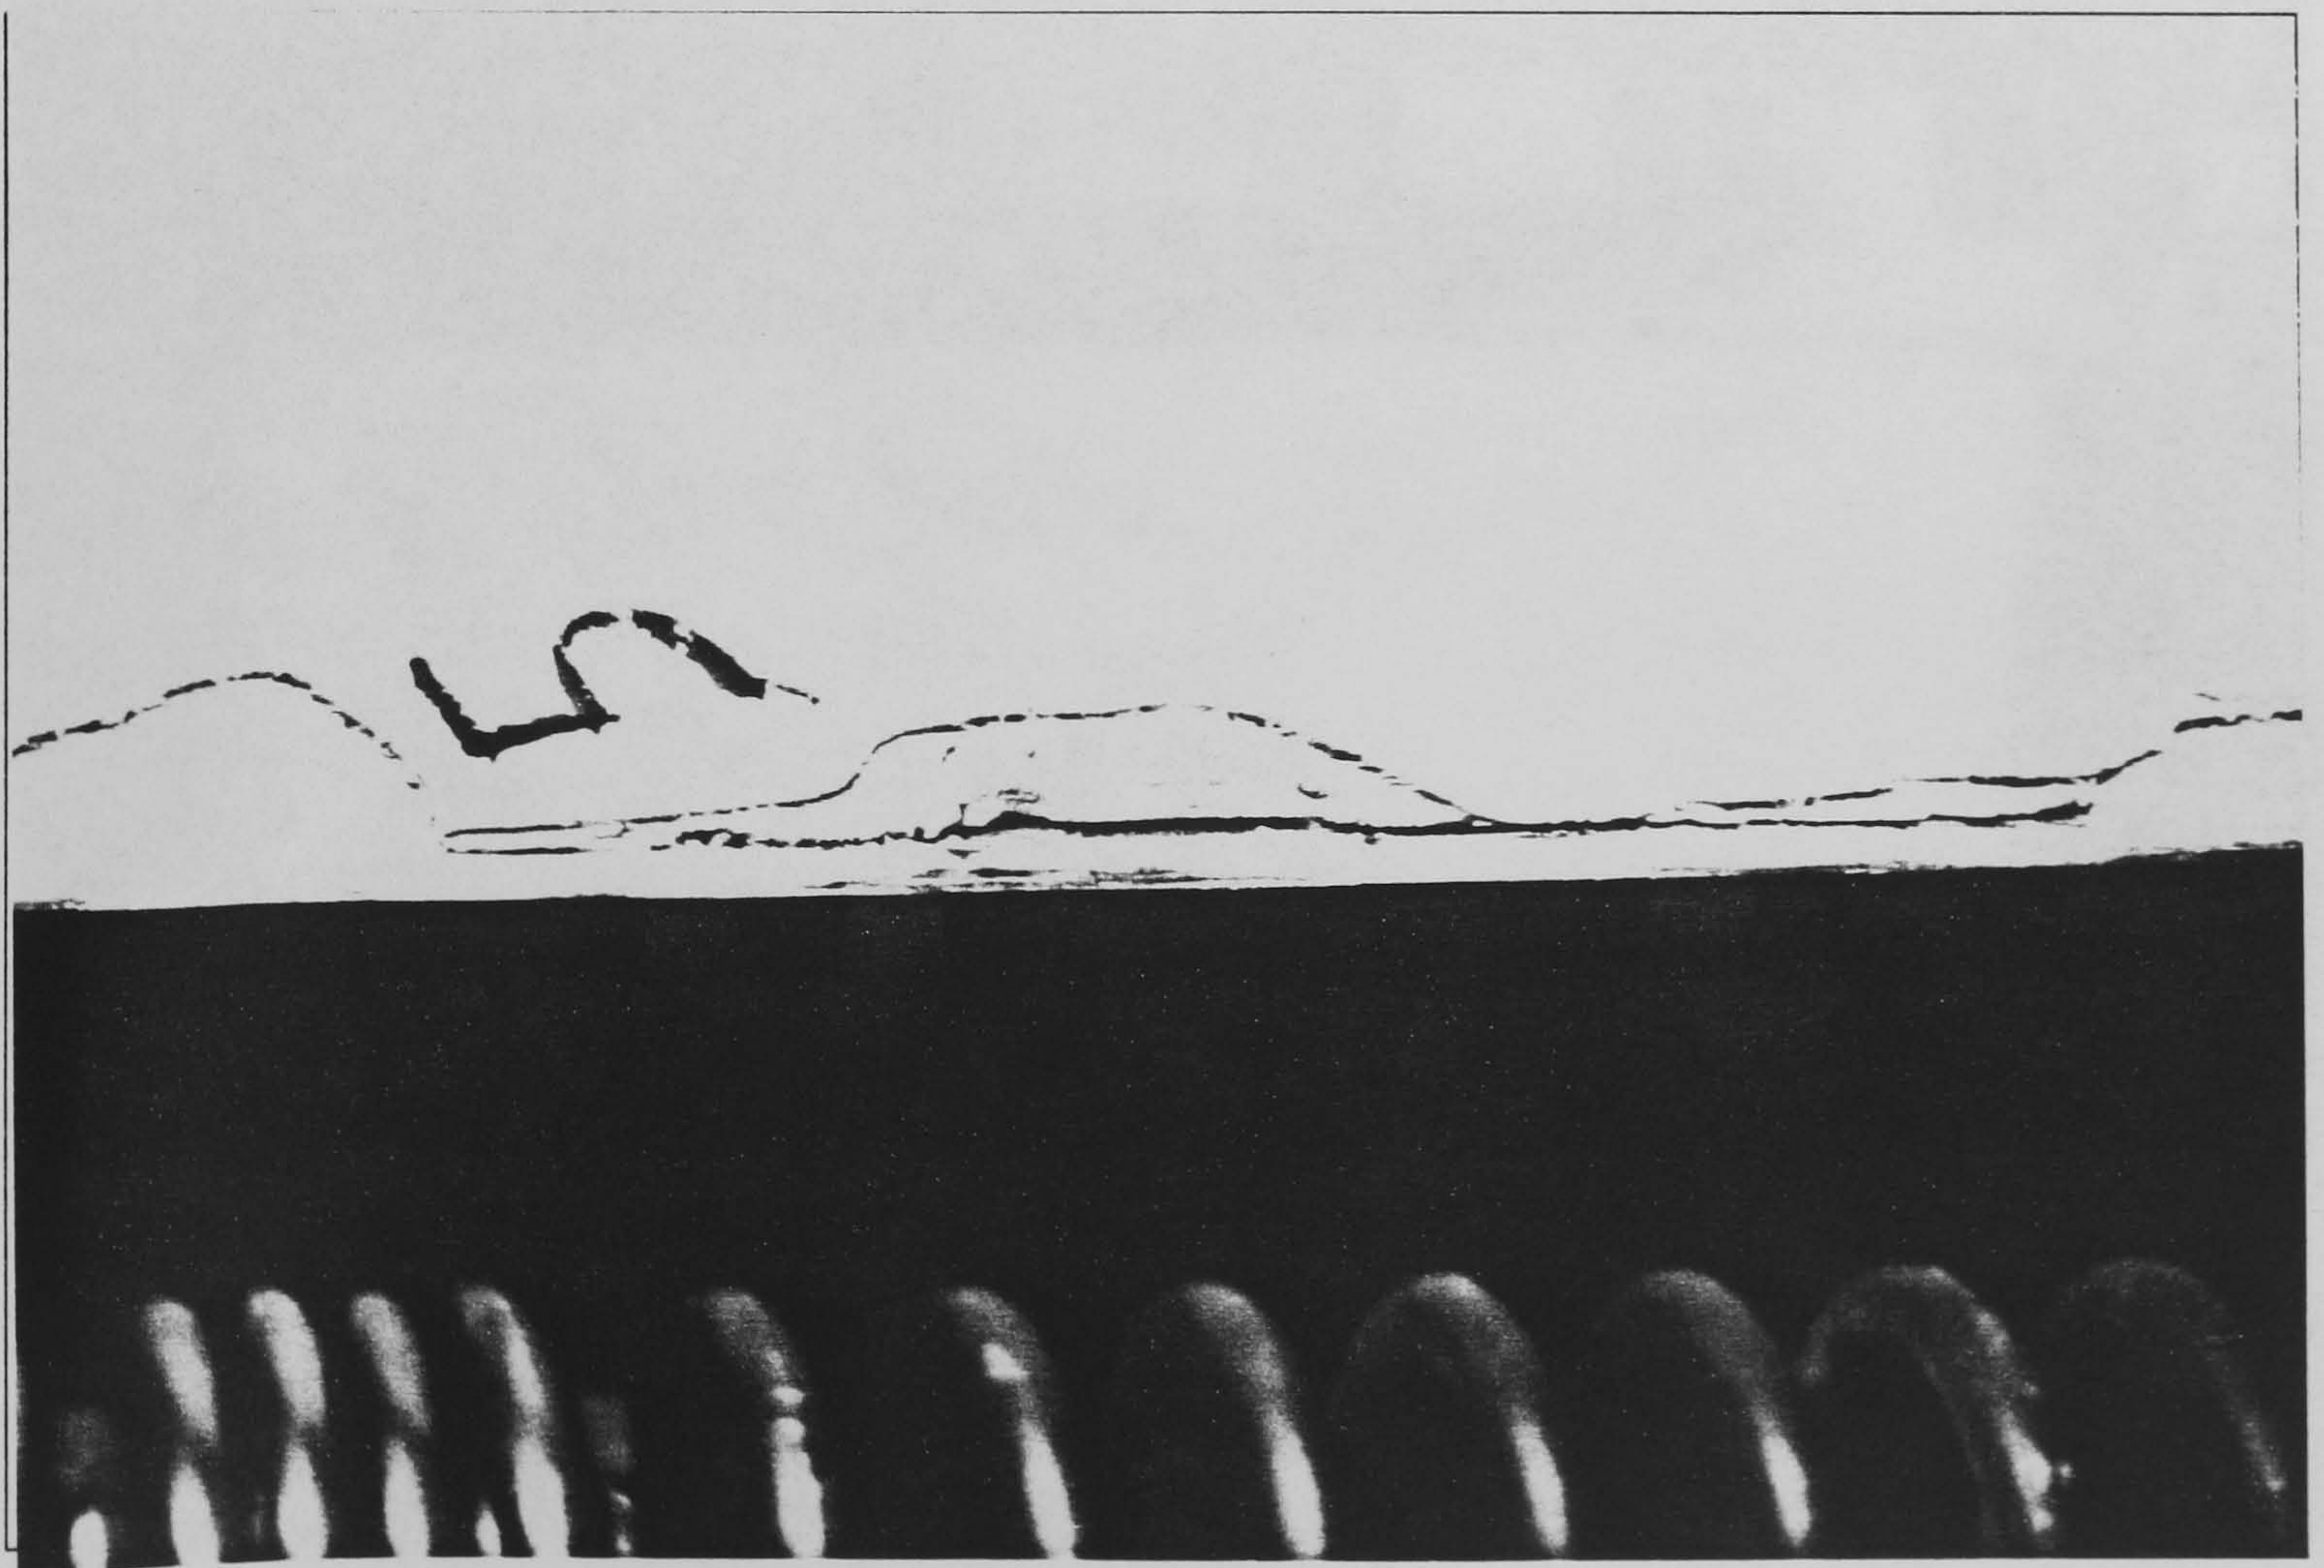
Column-panel separation and brick crushing (wall-O)
